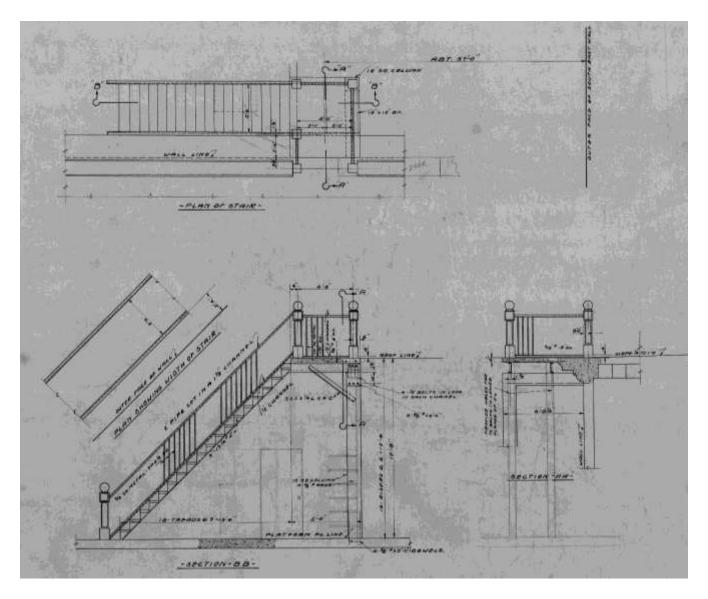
Detail of Pumping Station, Stair From Balcony To Roof (AES, Drawing No. 5315, 21 July 1920).
